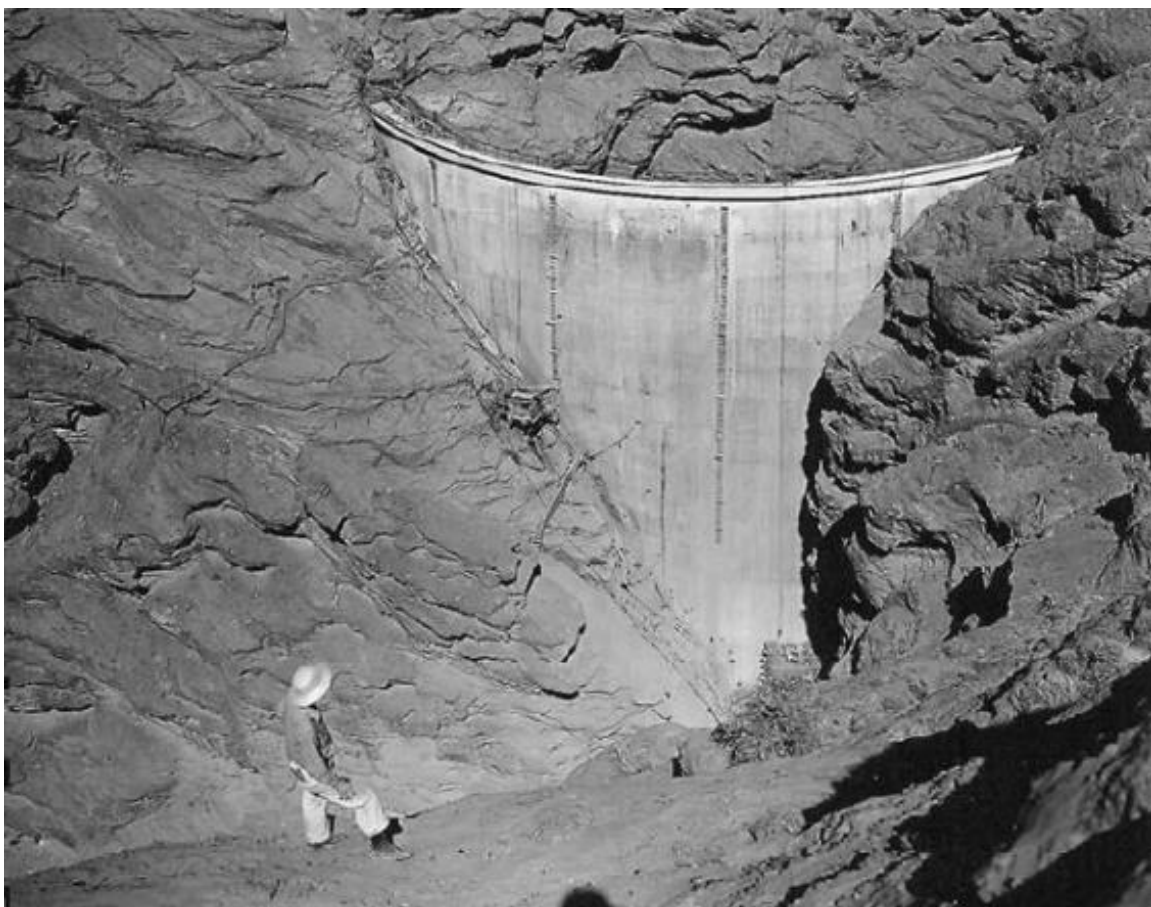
Copper Basin Dam, upstream dam face with ladder and trash rack, 1938. Source: Metropolitan
